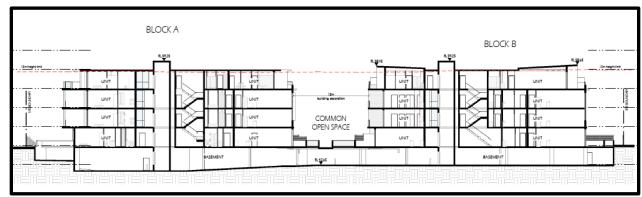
Section 1 of the buildings showing those parts of the roof that exceed the height limit (courtesy Zhinar Architects)
